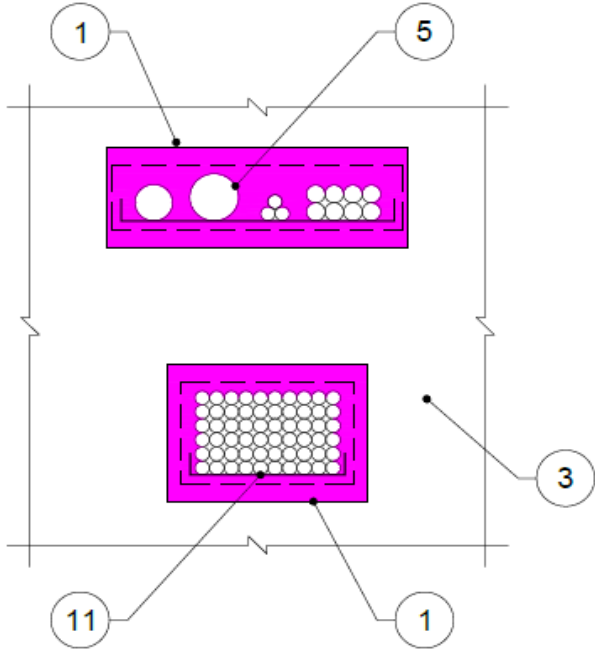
Plan view of D1 and D2 Cable Services in Floor
